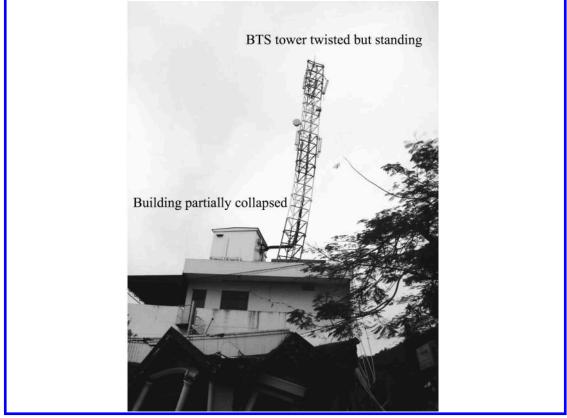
When the second story of this building collapsed, the tower was damage and power was cut off from this site. (Courtesy of Thomas Heriyanto)
